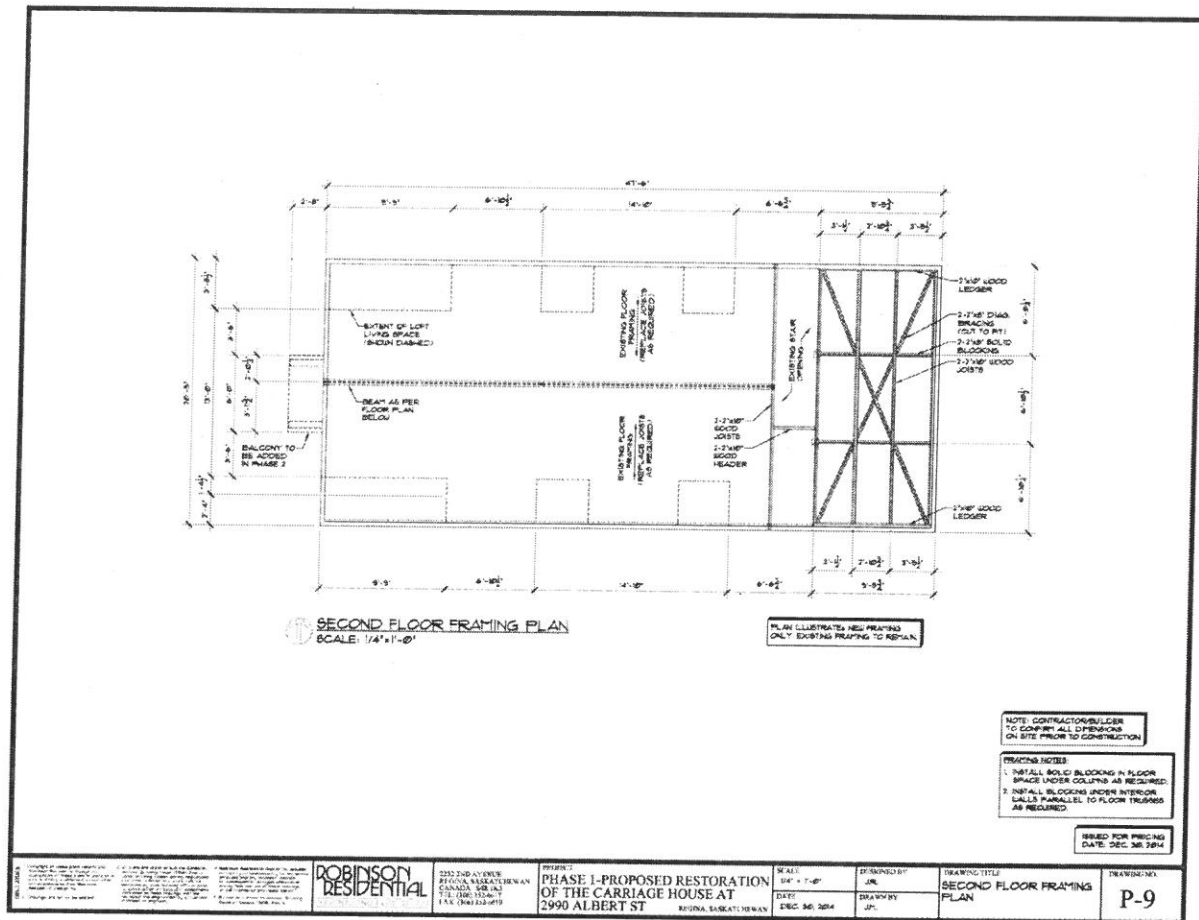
Second floor framing plan of the carriage house after the proposed rehabilitation.
